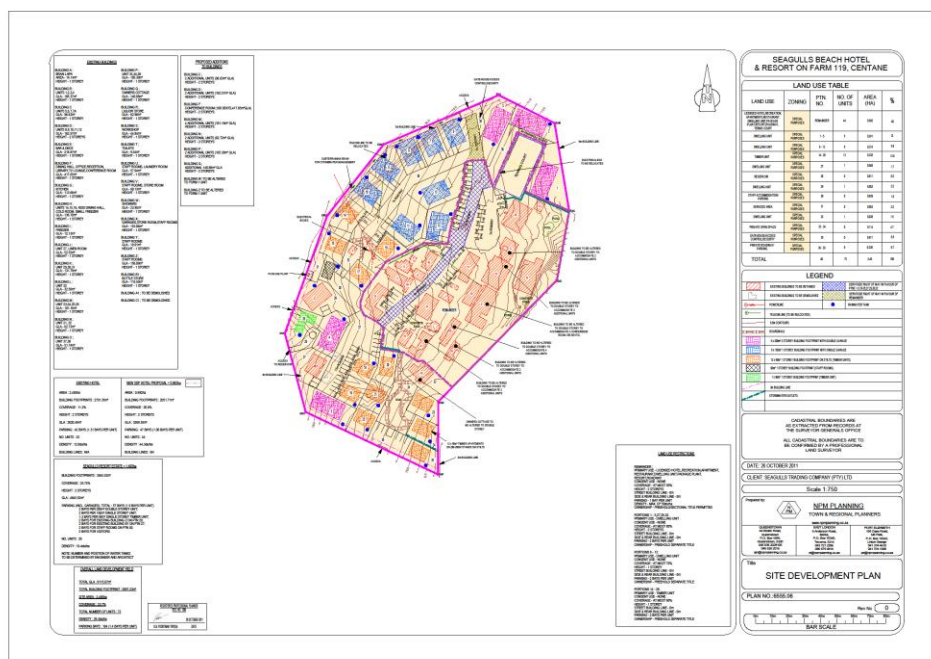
Least Preferred Site Layout Plan - Alternative A2 (Plan No: 6555.06)
